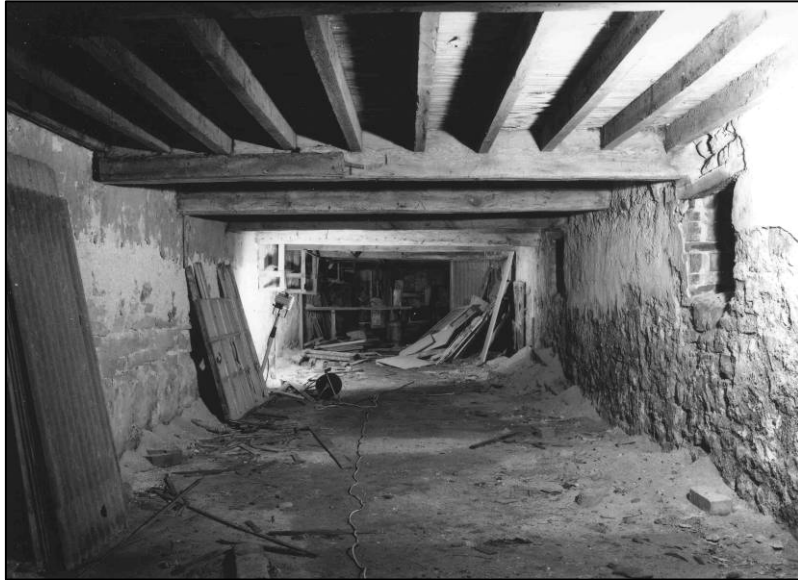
Ground floor area W of spine wall, looking SE (photo 5/1).
